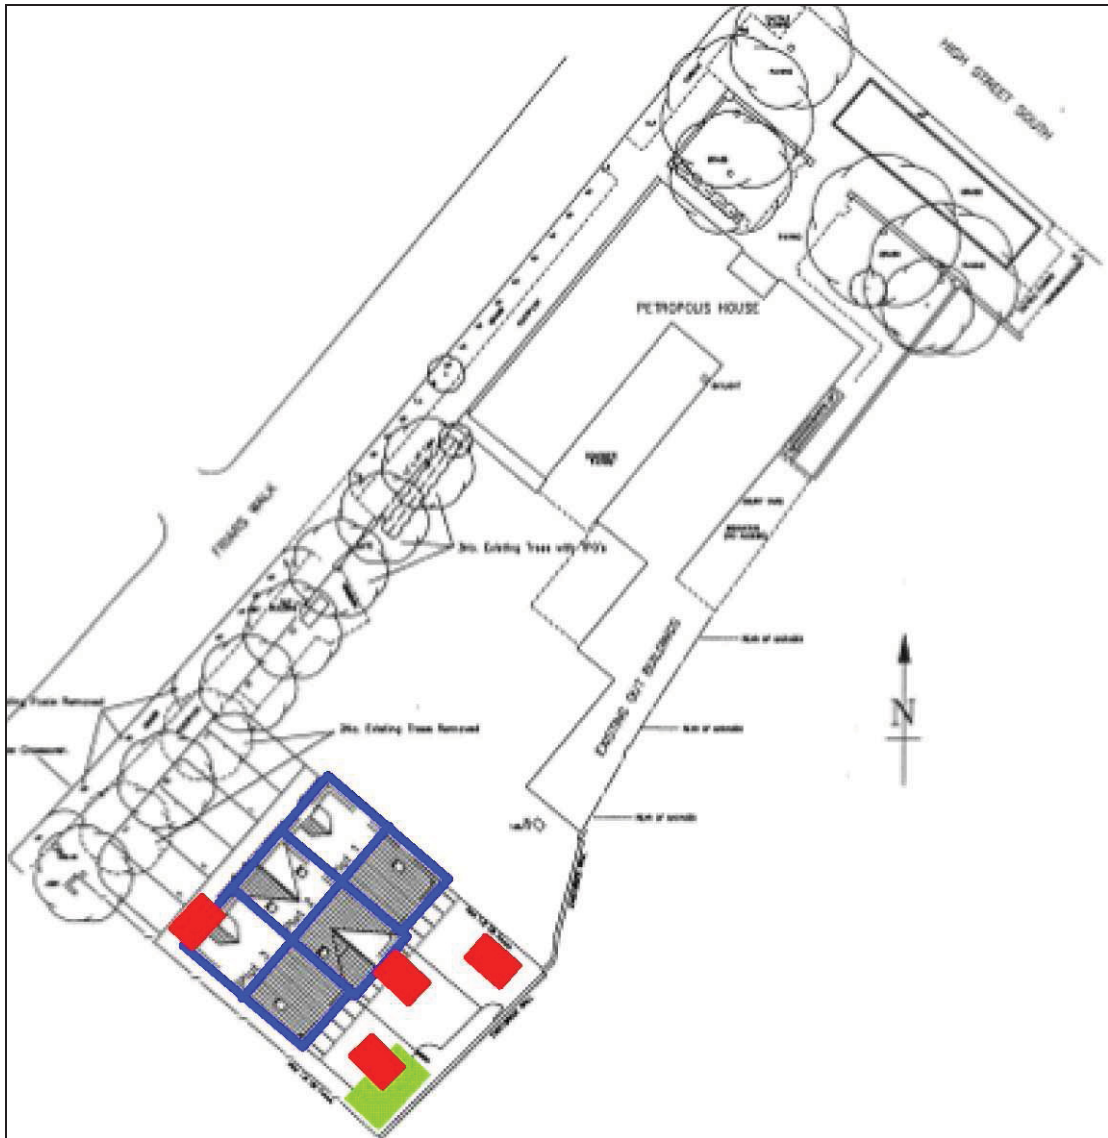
Proposed development showing footings in blue, soak-away in green and geotechnical pits in red (scale 1:250)
